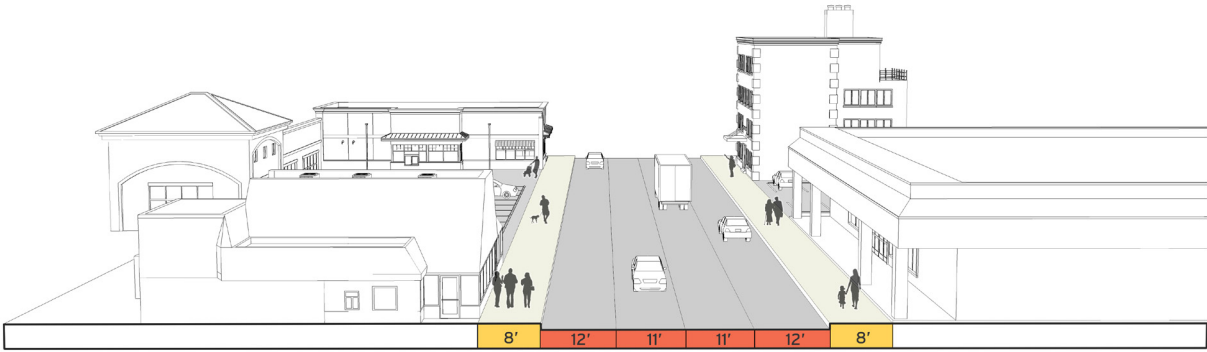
TYPICAL EXISTING SECTION ON INDEPENDENCE AVENUE
